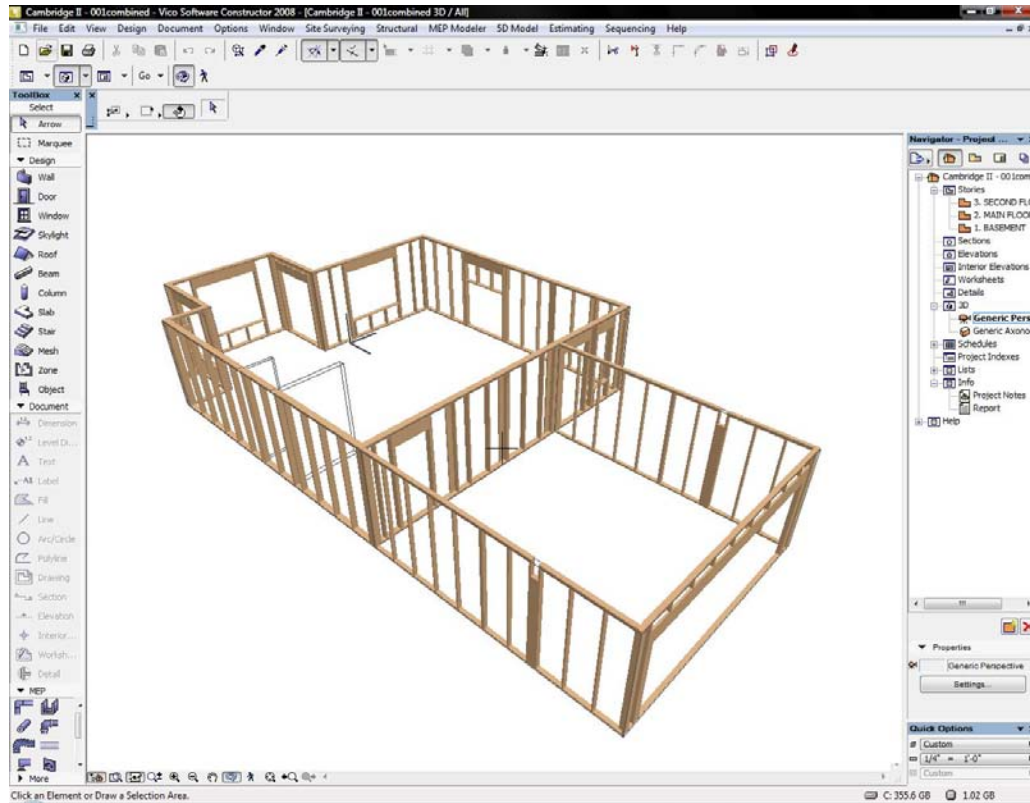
3D Modeling – Framing Design in Constructor 2008
